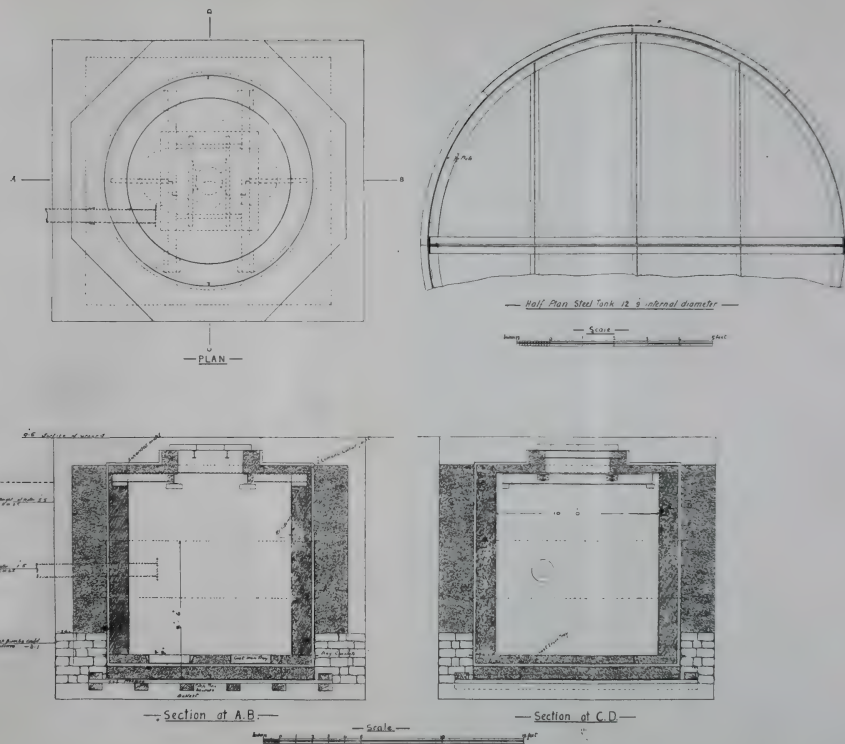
Chamber in Concrete with Steel-plate Lining, Seaford.
